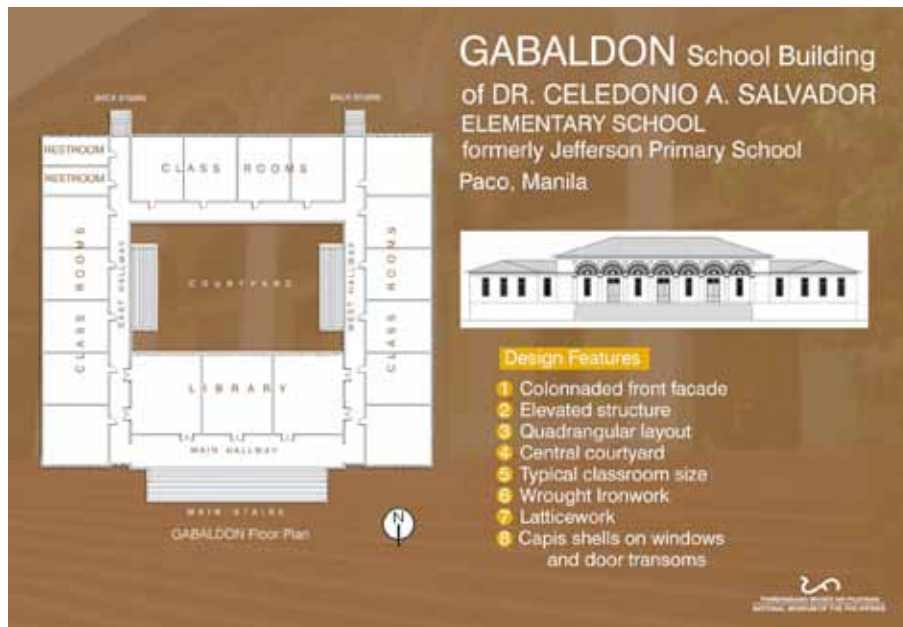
GSB Floor Plan. Source: <https://www.yodisphere.com/2021/06/gabaldon.html>.
